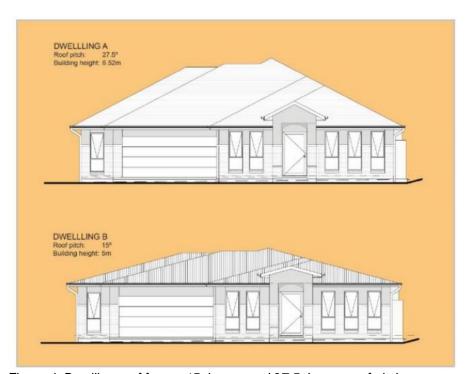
Dwelling roof forms, 15 degree and 27.5 degree roof pitches
